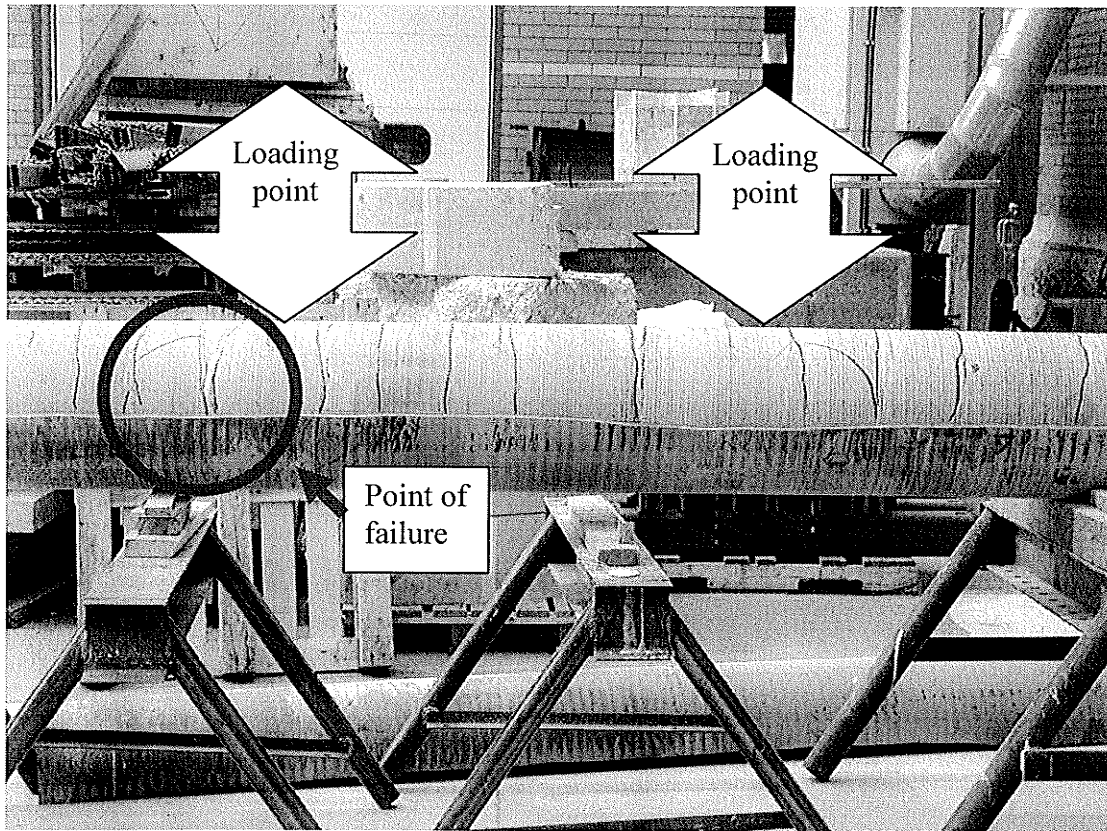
Cracks in specimen BFC1 after removing the GFRP tube
